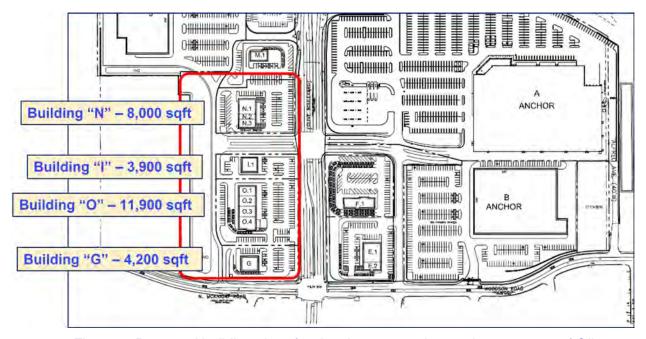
Proposed building sizes for development at the southwest corner of Olive Boulevard and McKnight Road.
